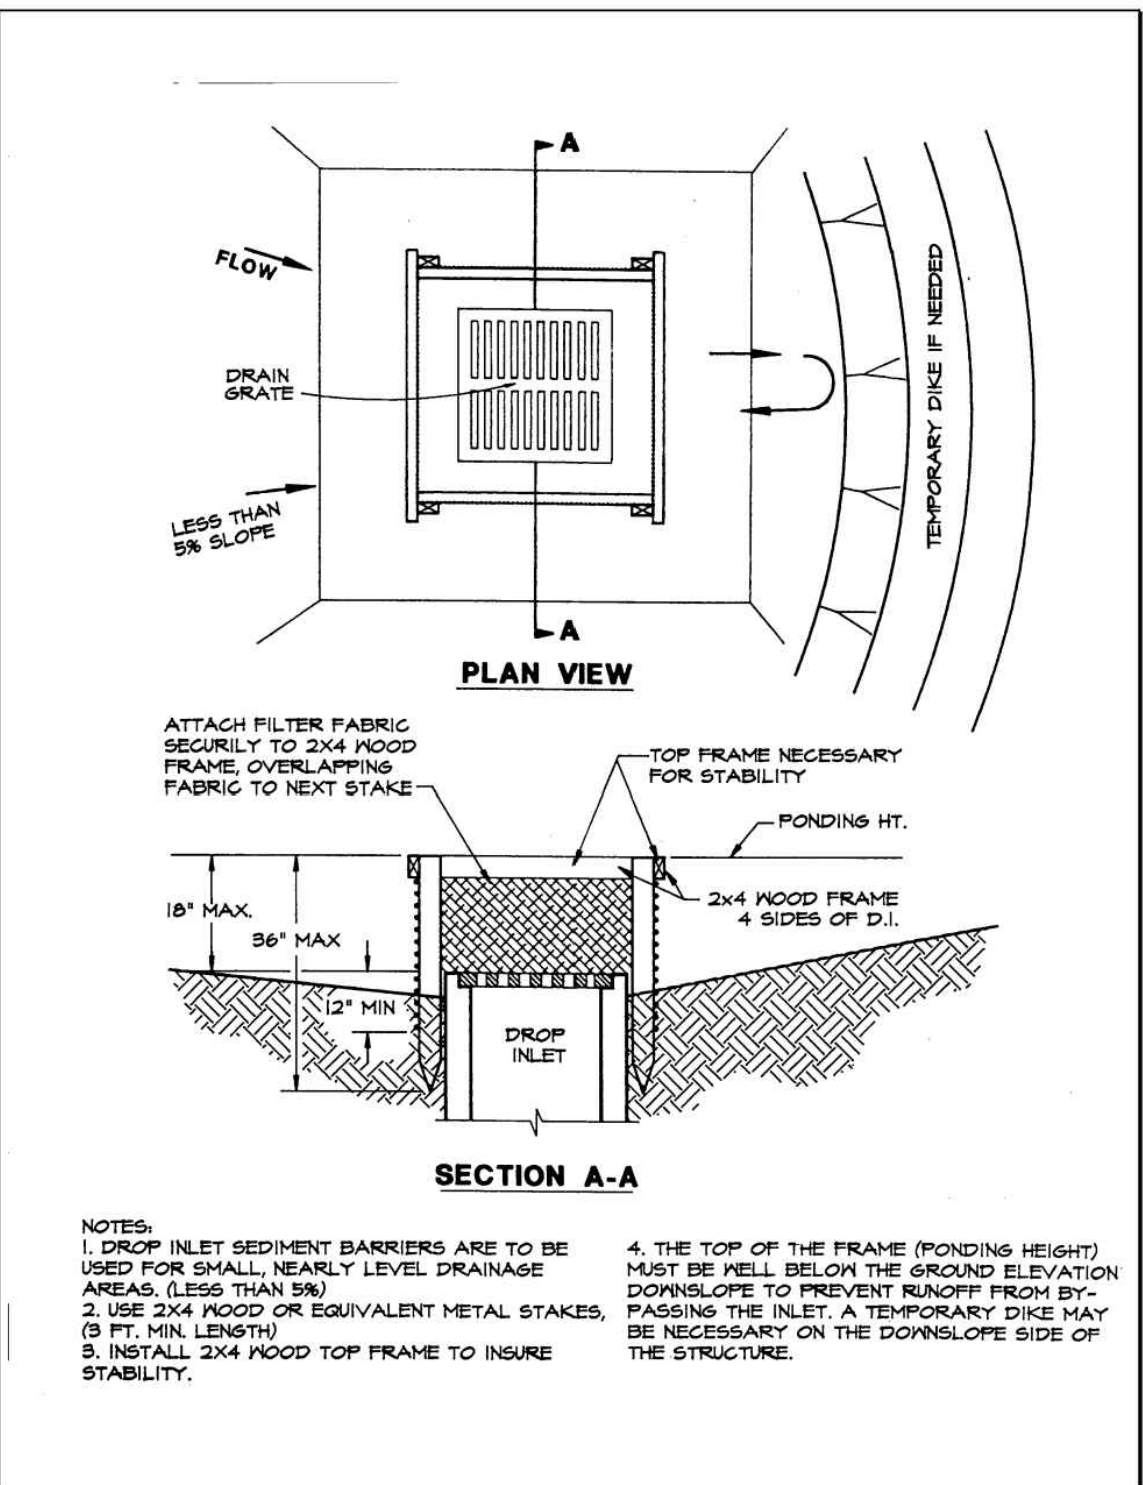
Silt Fence Drop Inlet Sediment Barrier
